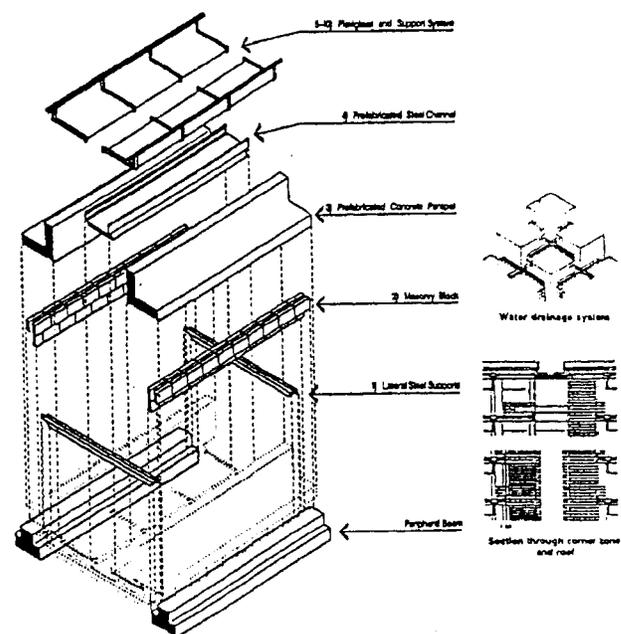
Herman Hertzberger Central Beheer Office Building. Deconstructed detail of roof drainage and skylight. Drawing by Hans Houser.
